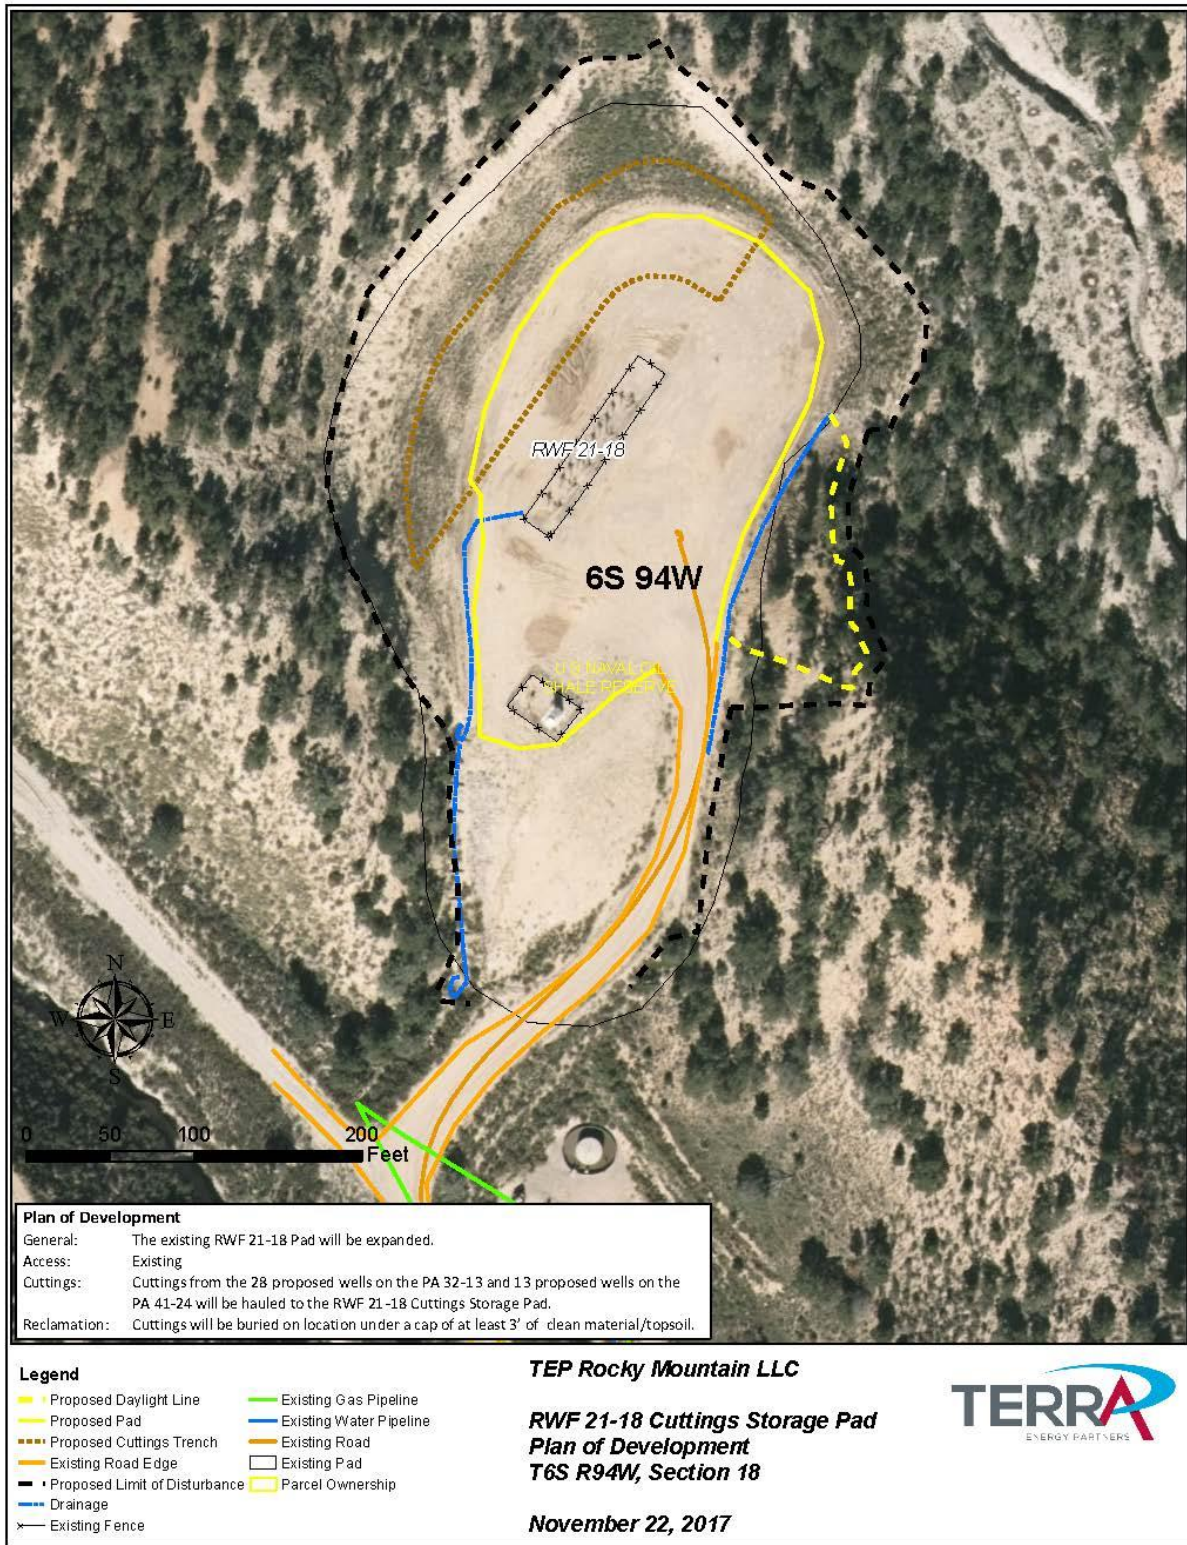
RWF 21-18 Cuttings Storage Pad Plan of Development
